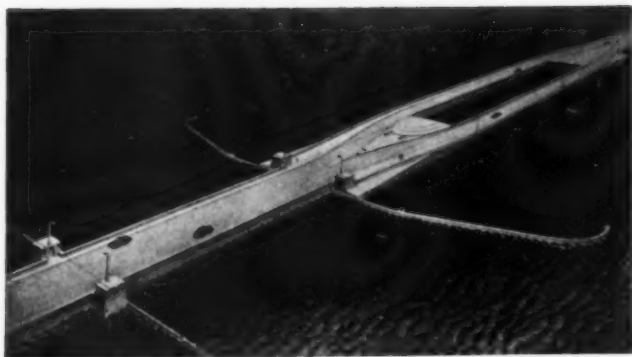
Artists' Perspective of Draw Pontoon Section. With Pontoon in Closed Position. Lagoon Between Roadways Is Area Into Which Draw Pontoon Is Pulled When Open
